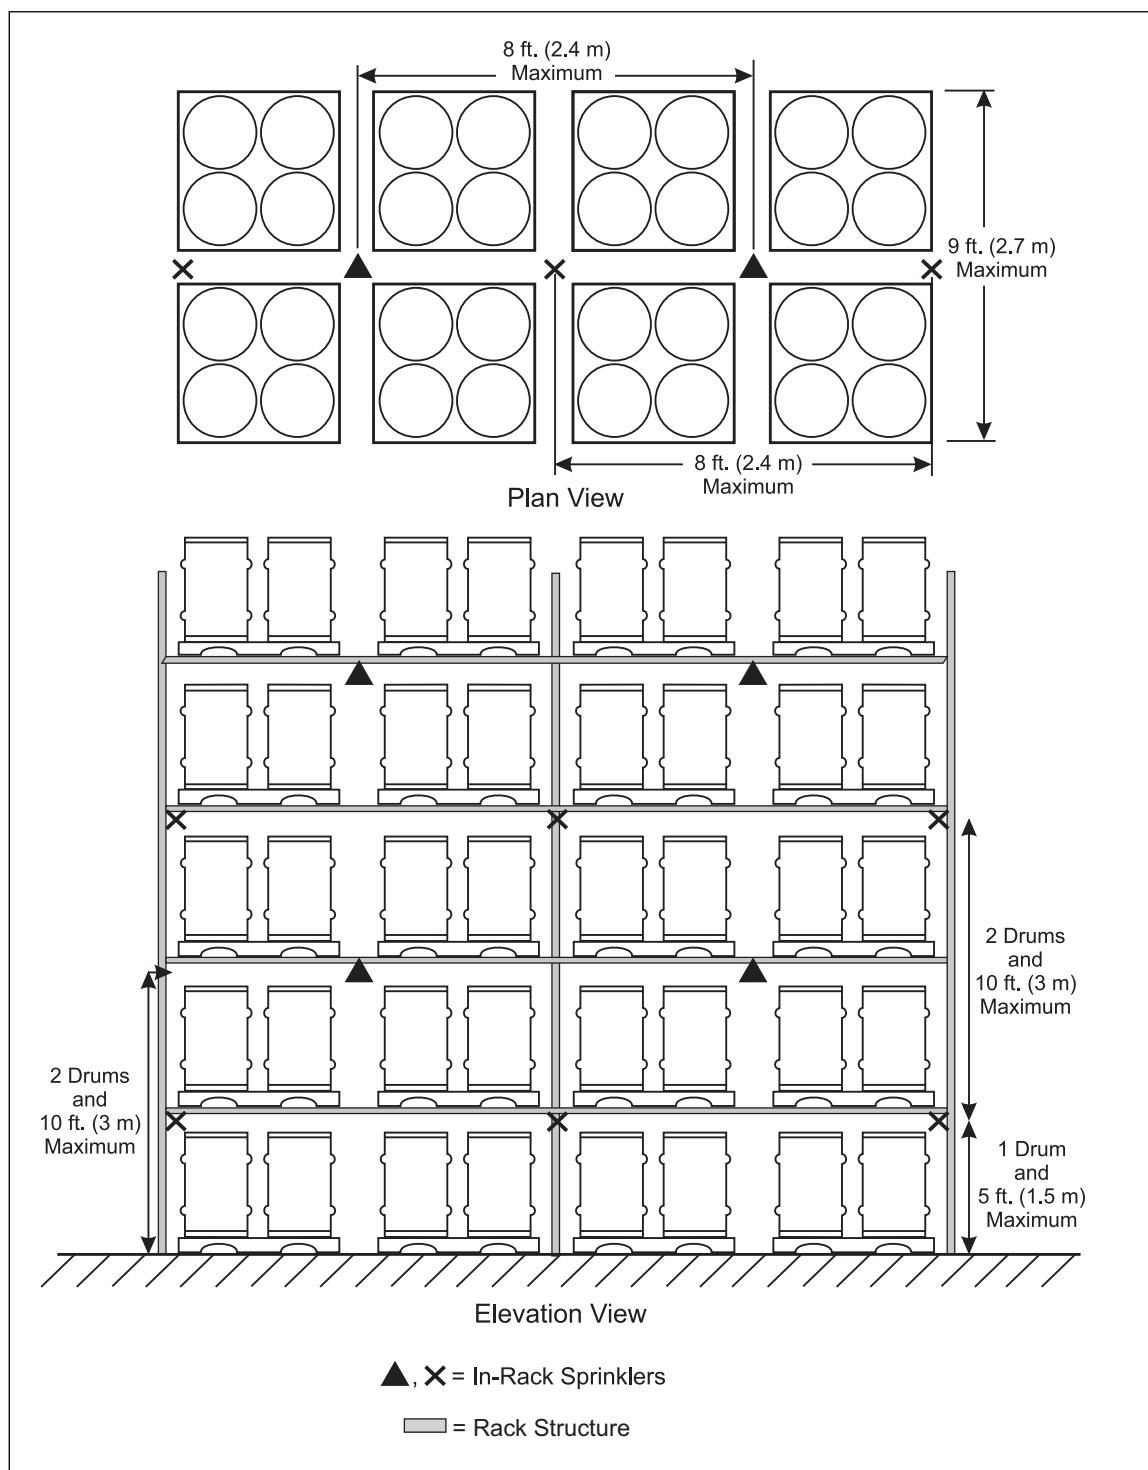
Double-row rack sprinkler layout: drum protection scheme
